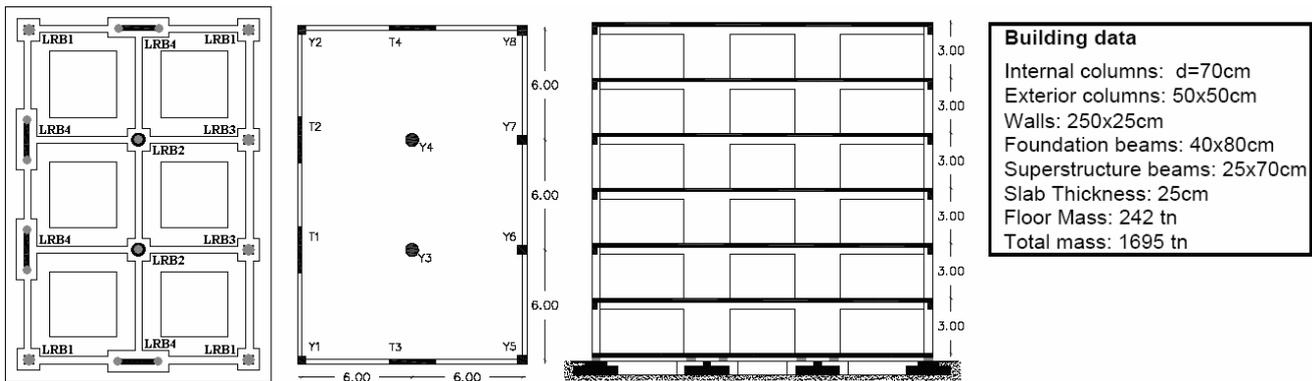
Plan view (foundation and superstructure) and elevation view of the building.
